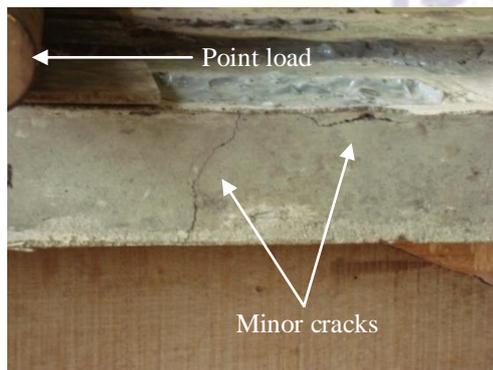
Minor hairline cracks spotted on 4-connector slab
